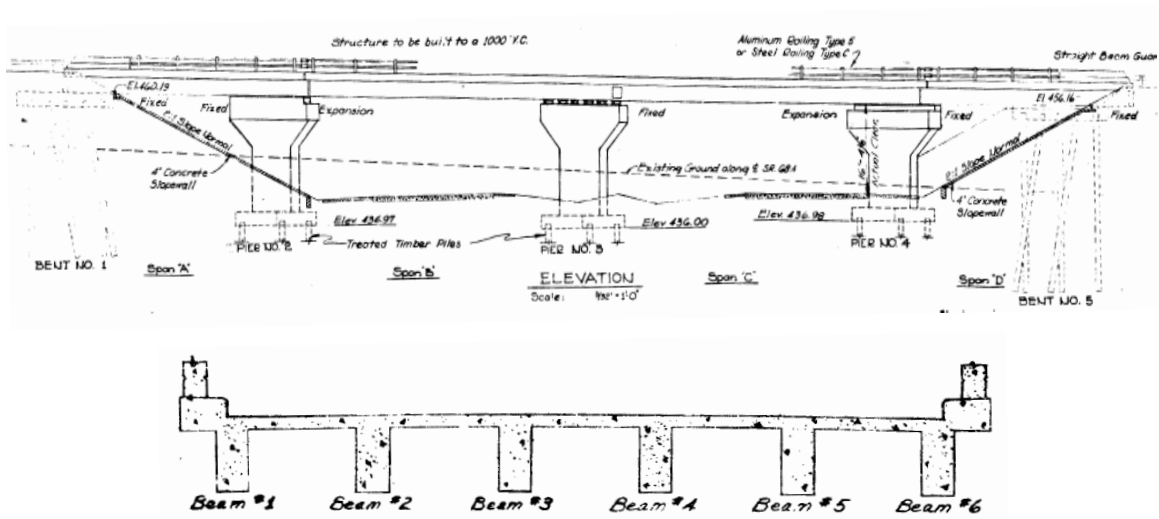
Bridge elevation and cross-section as reported in drawings
